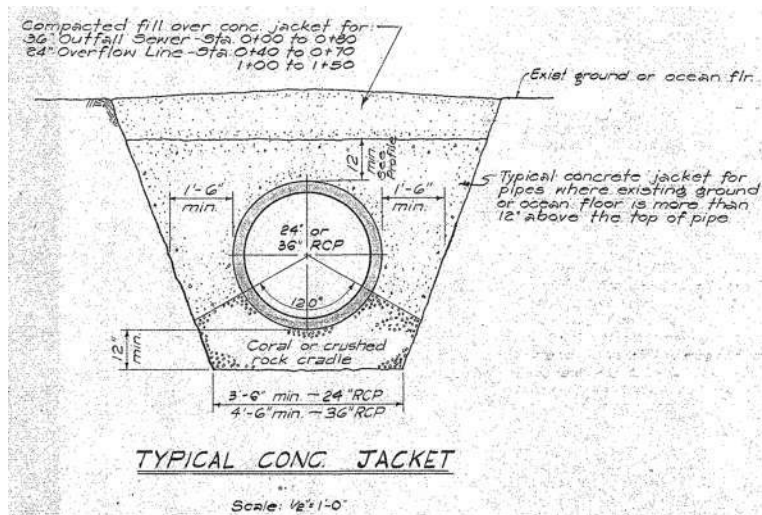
Typical section of original trenched outfall configuration from 1966-dated as-built plans for 36-inch pipe.
